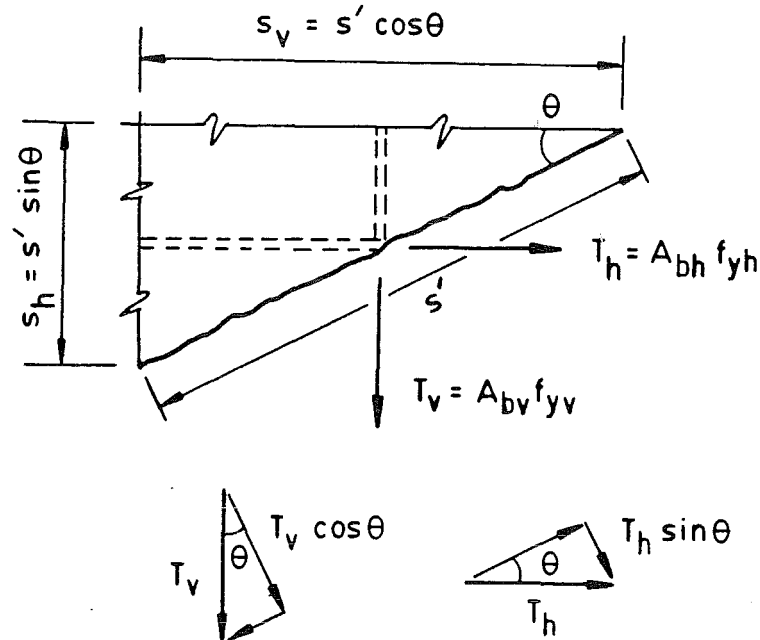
Forces in reinforcement crossing a potential inclined web crack
